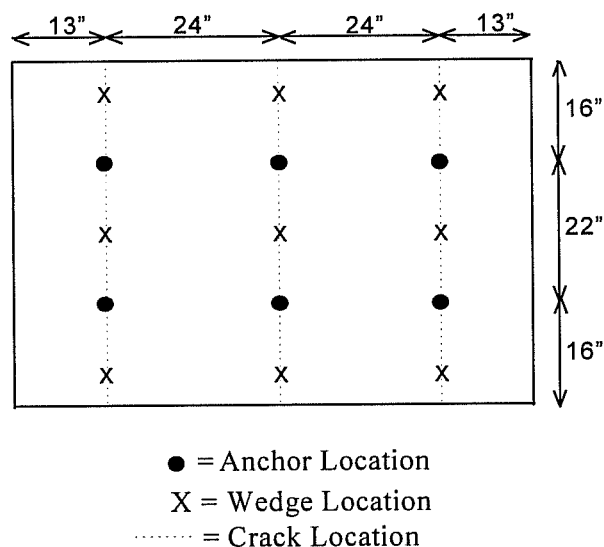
Location of Splitting Wedges and Anchors for Tension Tests
